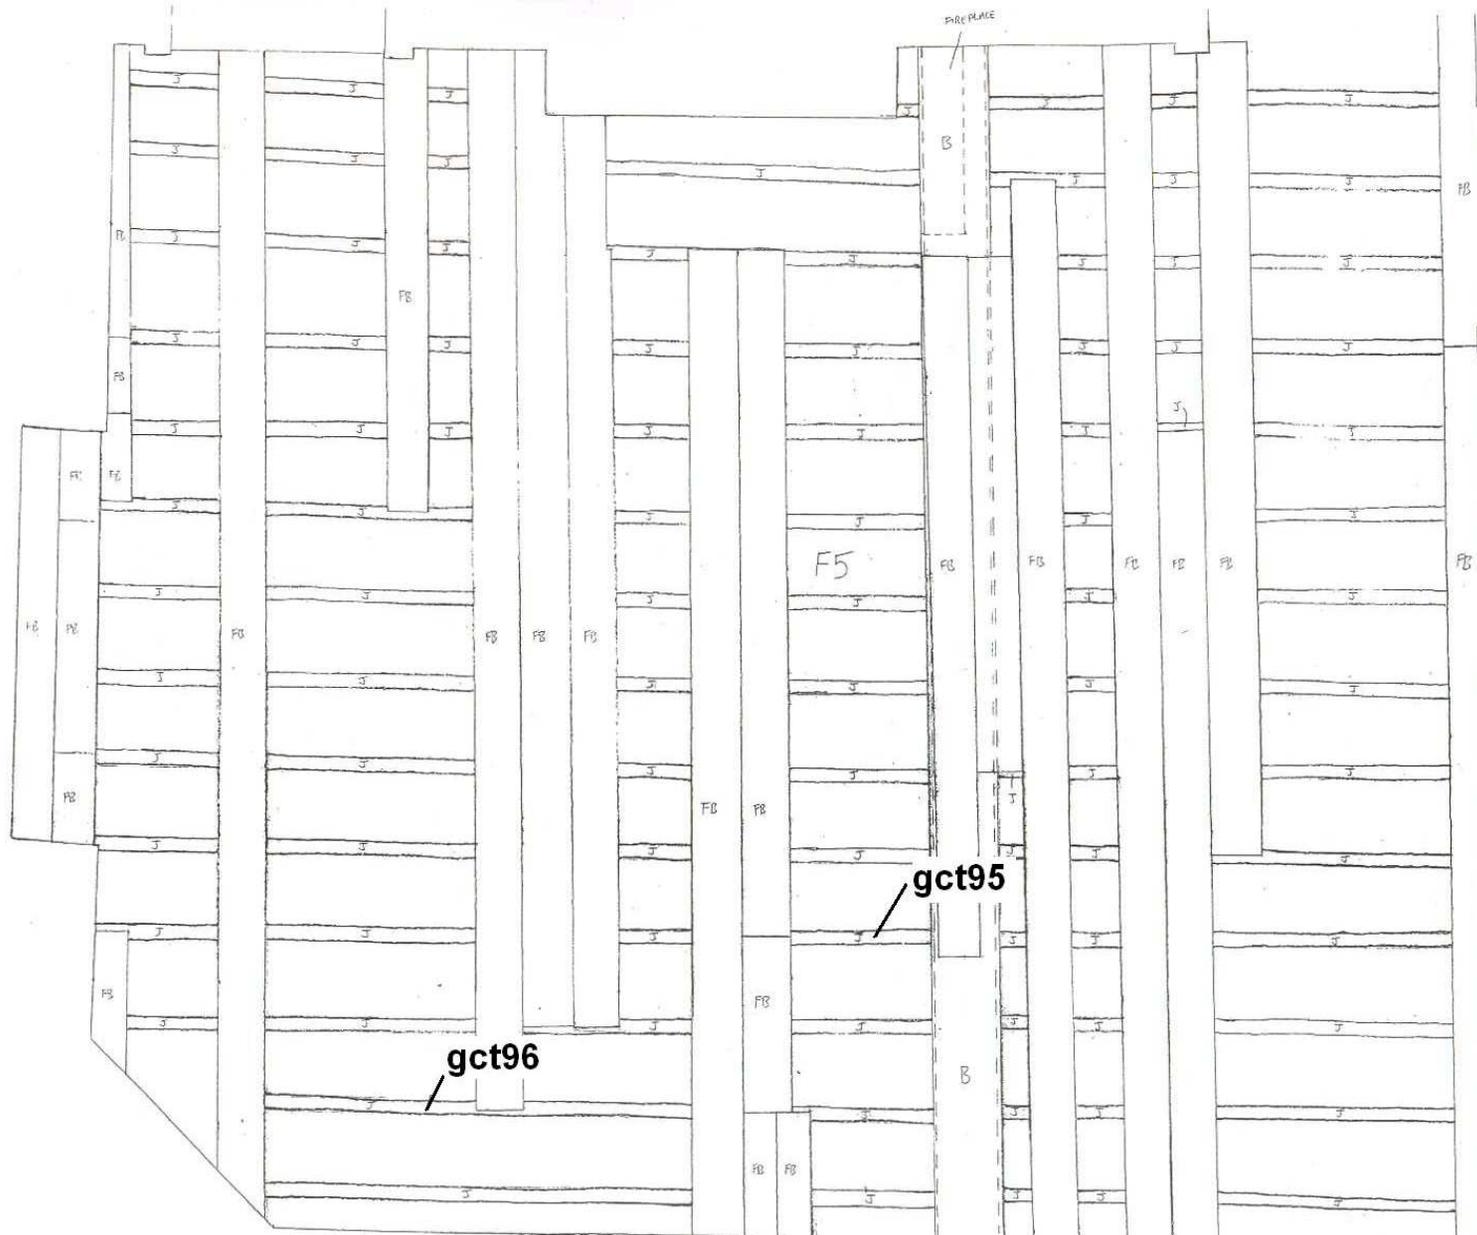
Floor plan of room F5 showing the timbers sampled for dendrochronology
